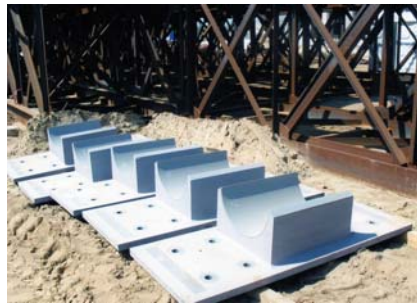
Cast steel support bearings for the carrying girders and components of mounting towers (in the background) stored on the construction site
